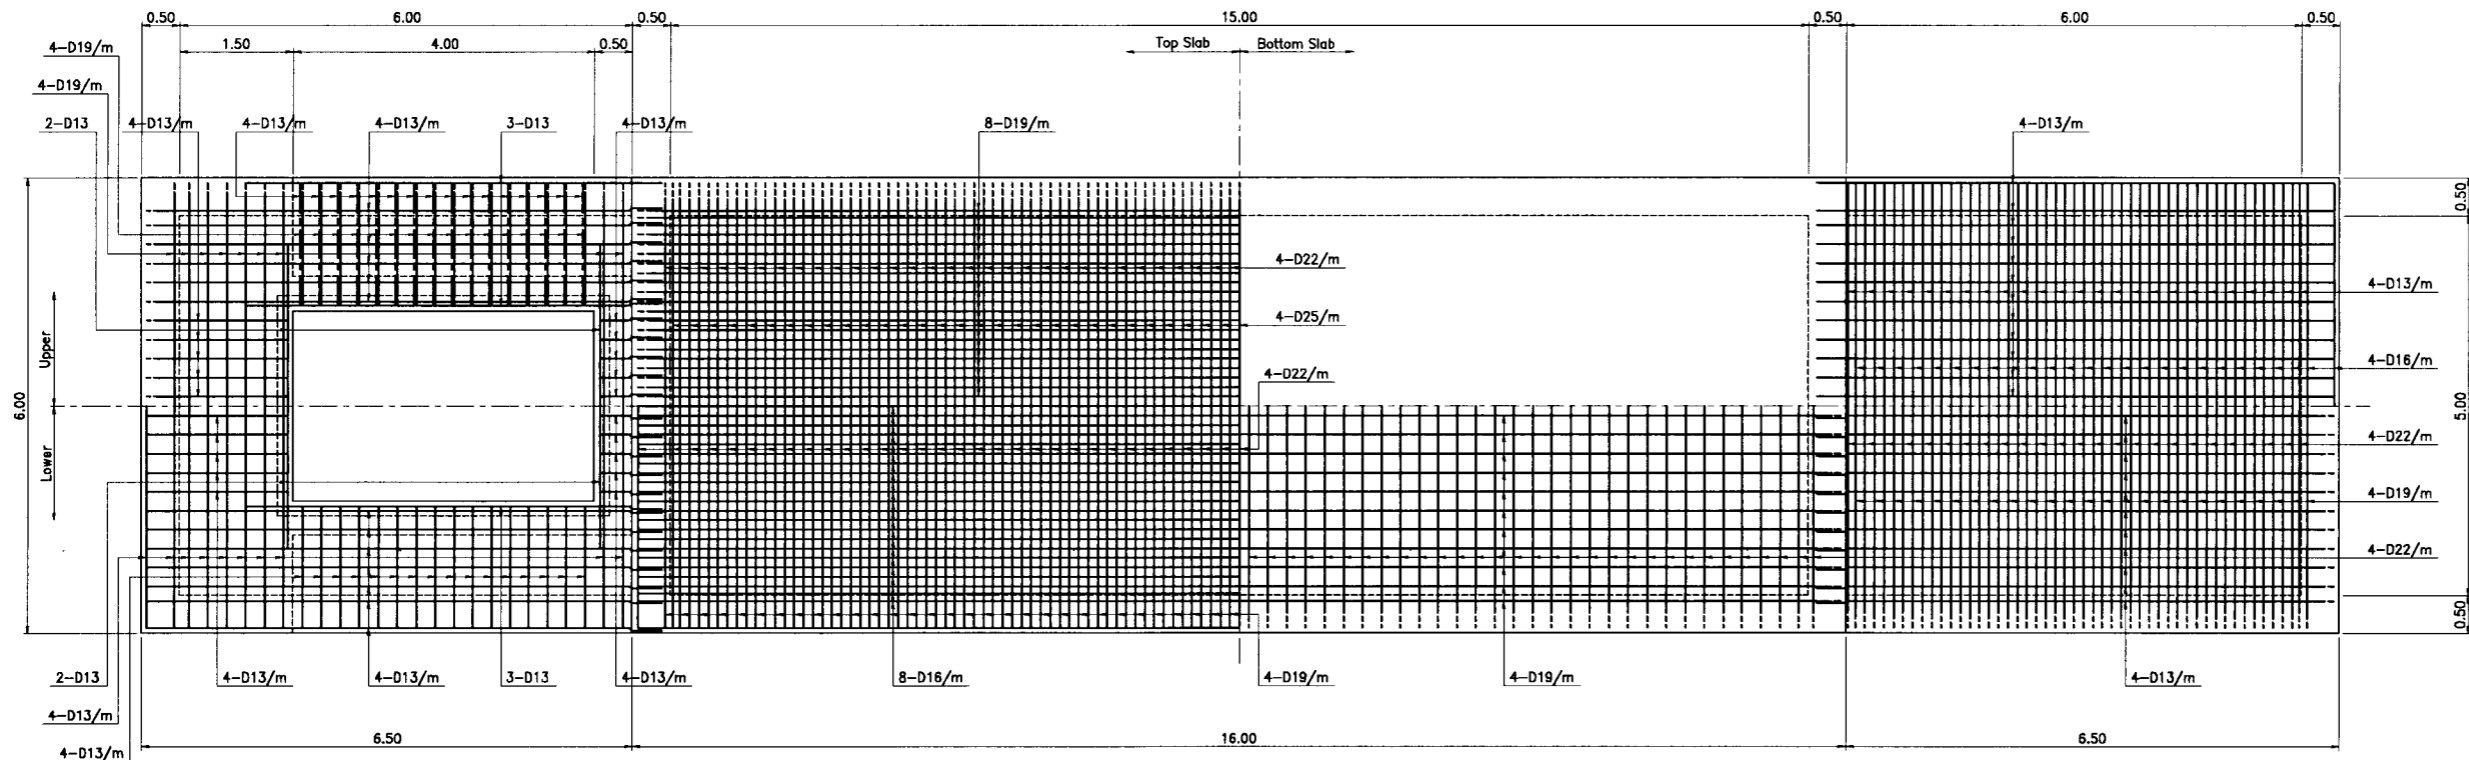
DETAIL FOR PIT COVER (PRECAST CONCRETE)
